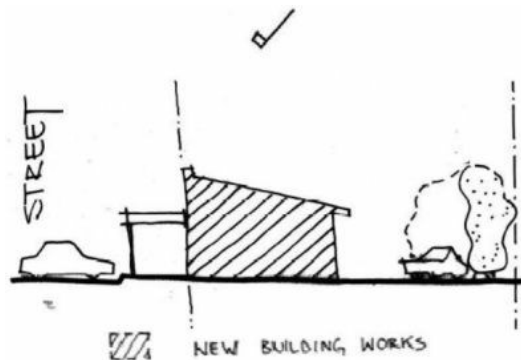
Non-residential building with no setback to street boundary, awning over the footpath and parking on the street or behind the building
